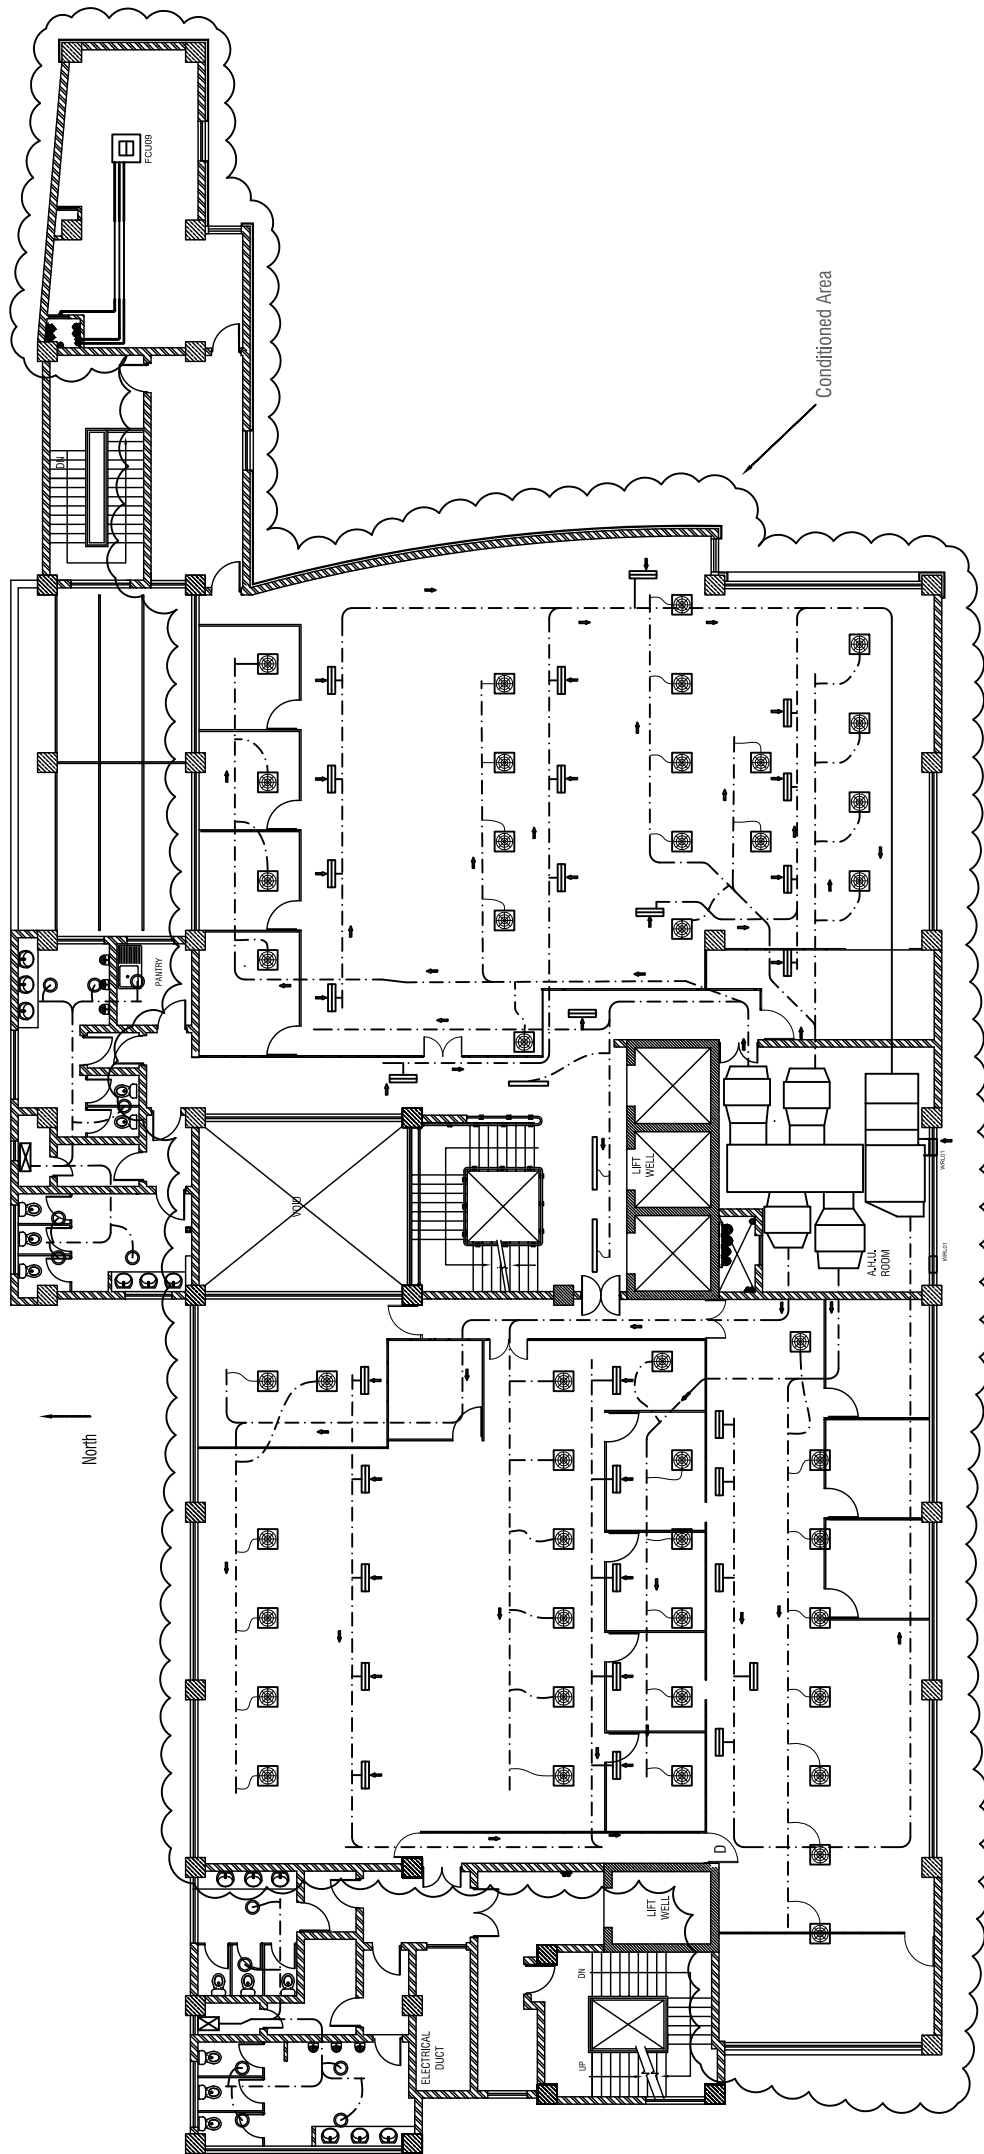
Ceylon Petroleum Corporation Head Office Building - Seventh Floor
